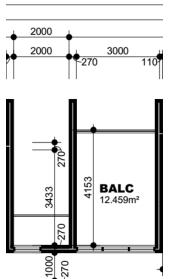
Articulated area and side balcony within Unit 5, situated on the first floor (MacGillivray Architects, 2017)
